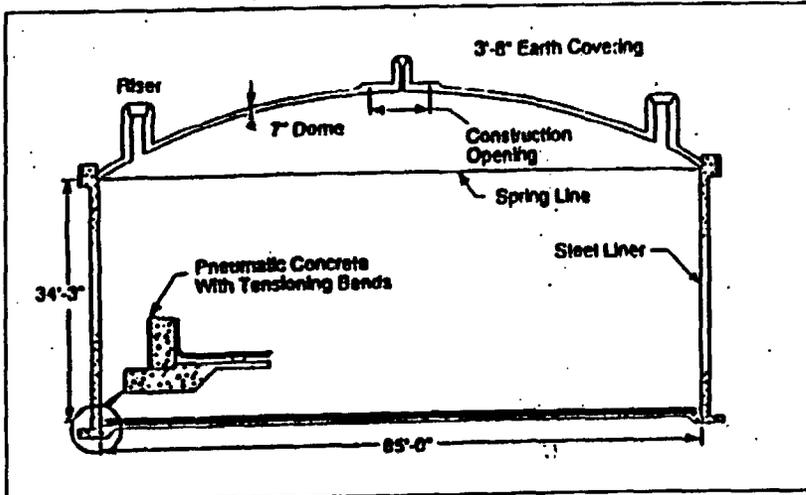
C. Uncooled Waste Storage Tank, Type IV (Prestressed Concrete Walls, 1,300,000 Gallons)
